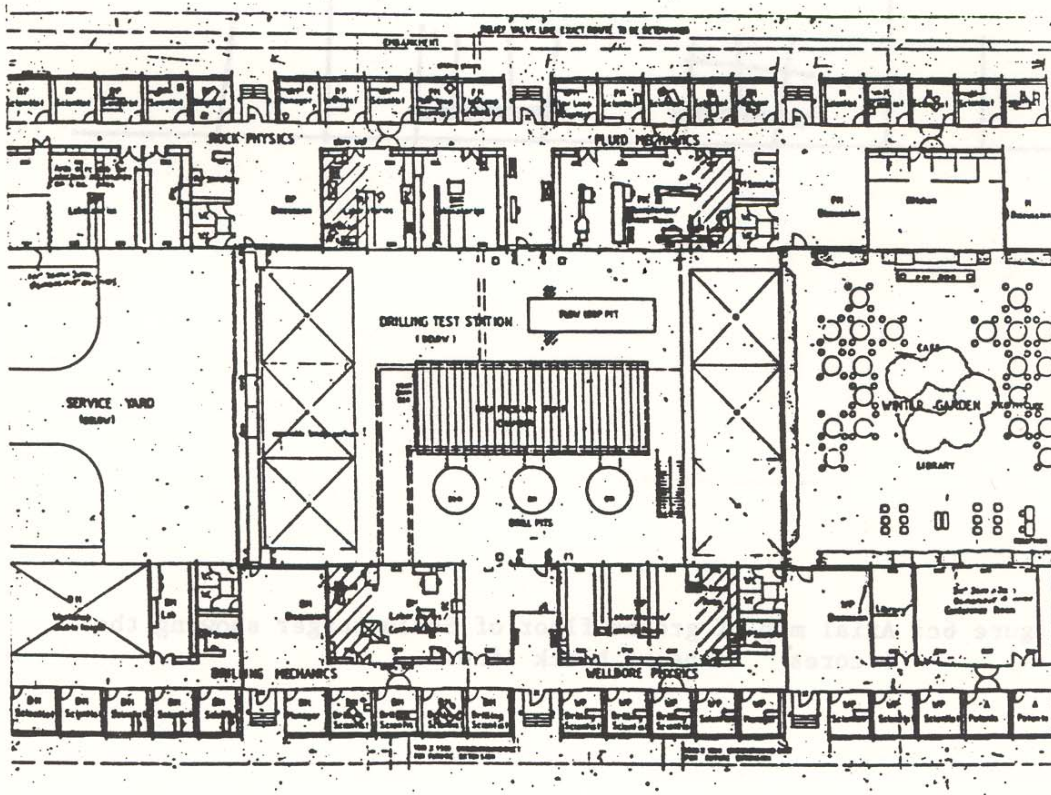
Ground floor plan of the Schlumberger laboratory at Cambridge
